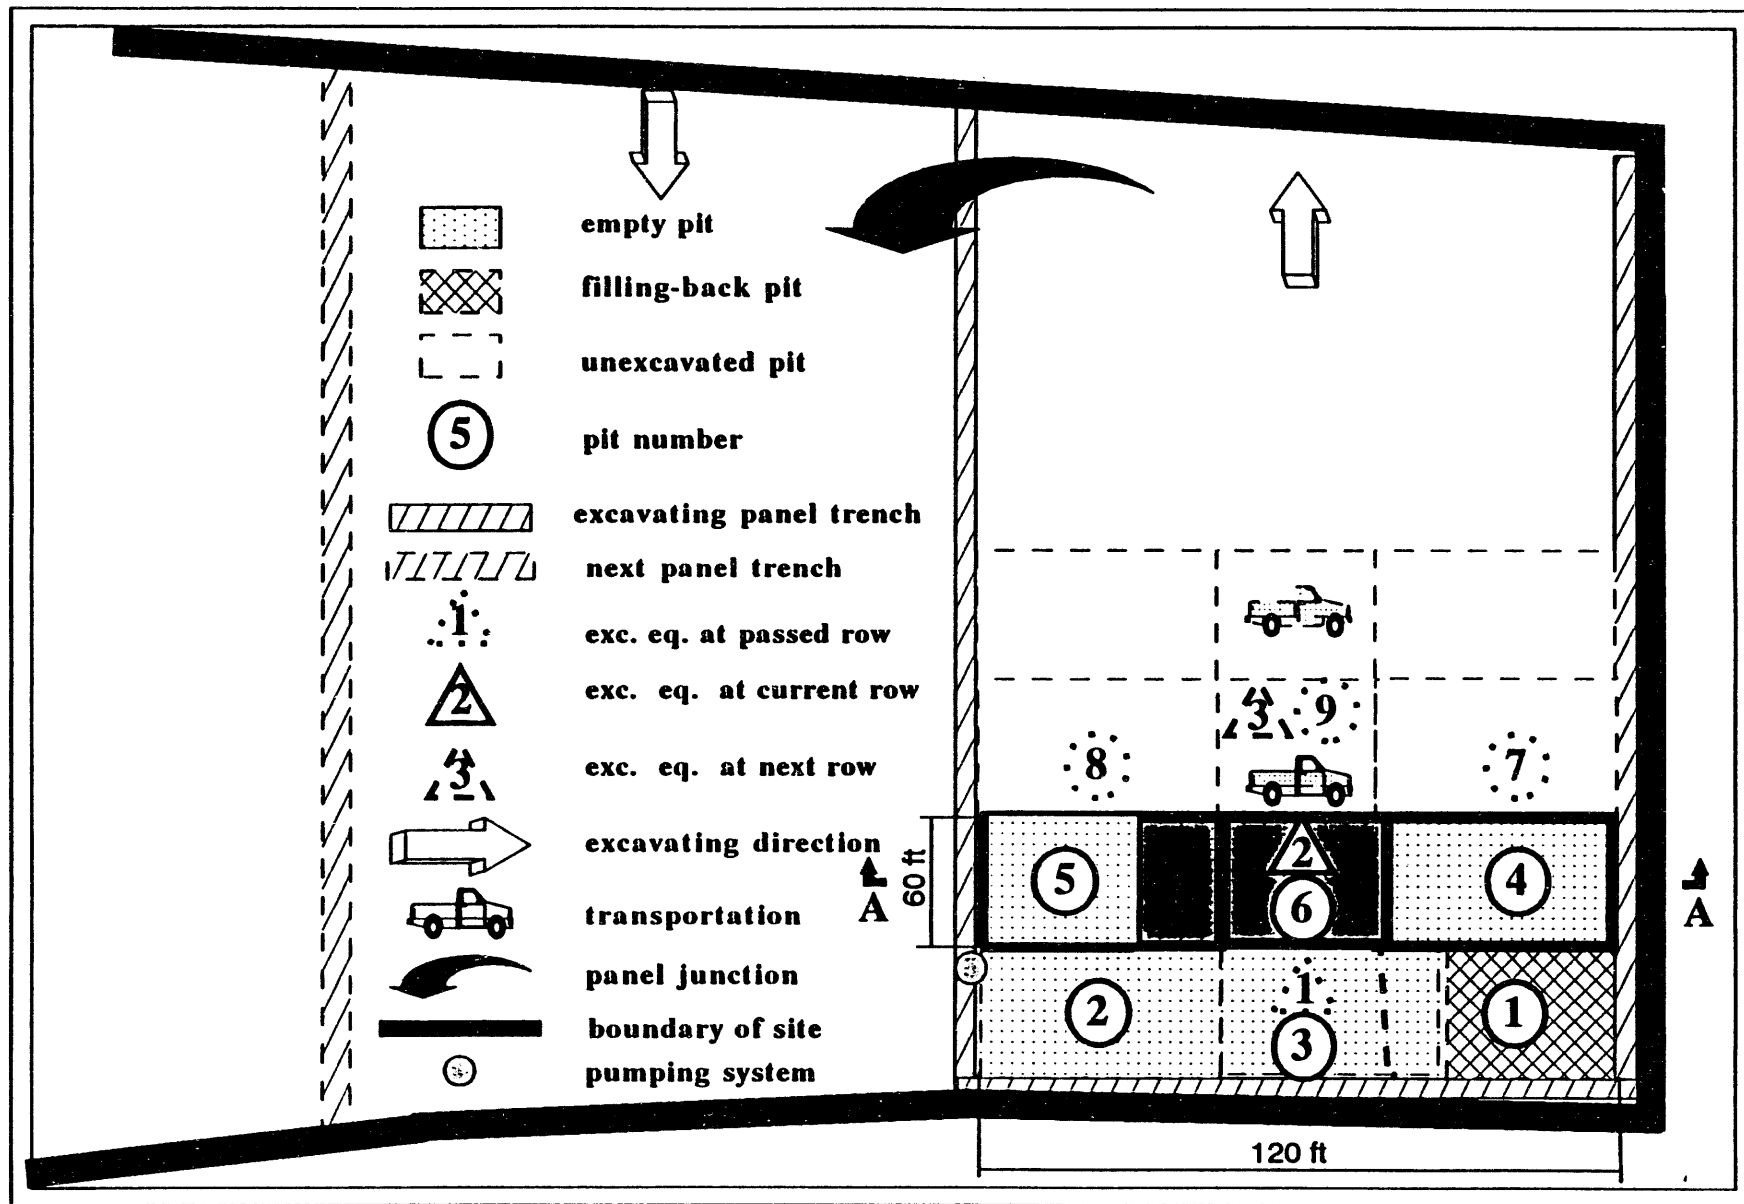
Schematic Diagram of Alternative-Pit Excavation System
